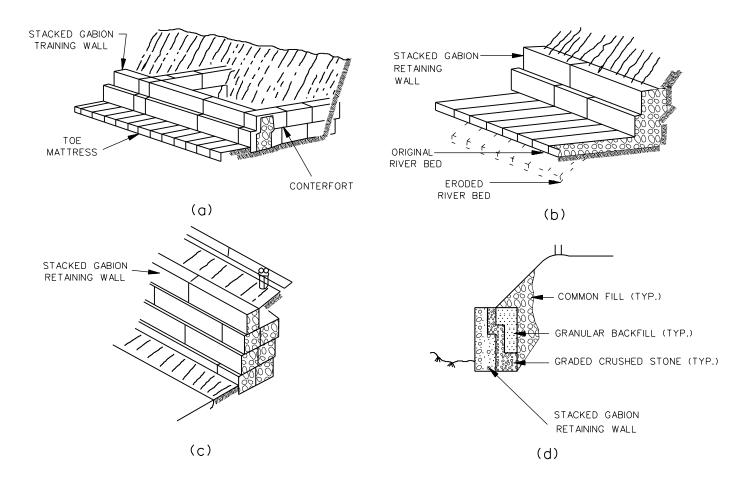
Typical Stacked-Block Gabion Revetment Details: (a) training wall with counterforts; (b) stepped-back low retaining wall with apron; (c) high retaining wall, stepped-back configuration; (d) high retaining wall, batter type
